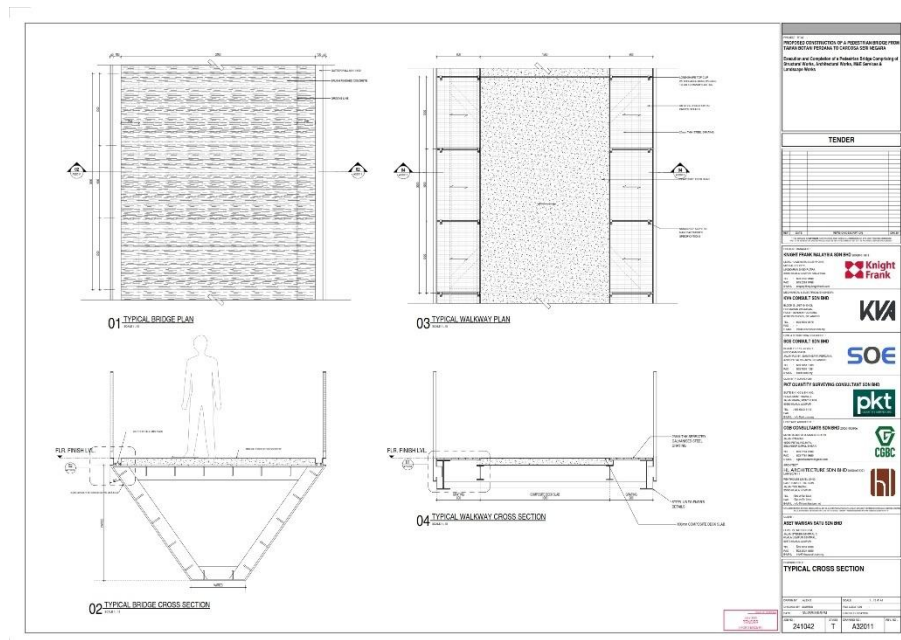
3 Typical Cross Section Plan Detail Drawing
